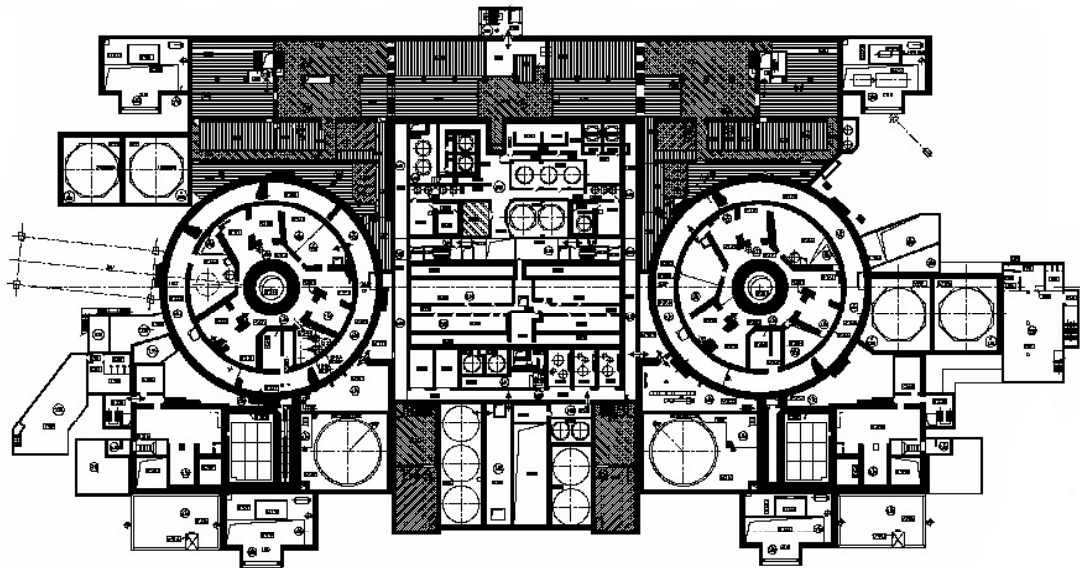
6 CNP1000 - Plant general arrangement plan at EL. + 5.00 m
